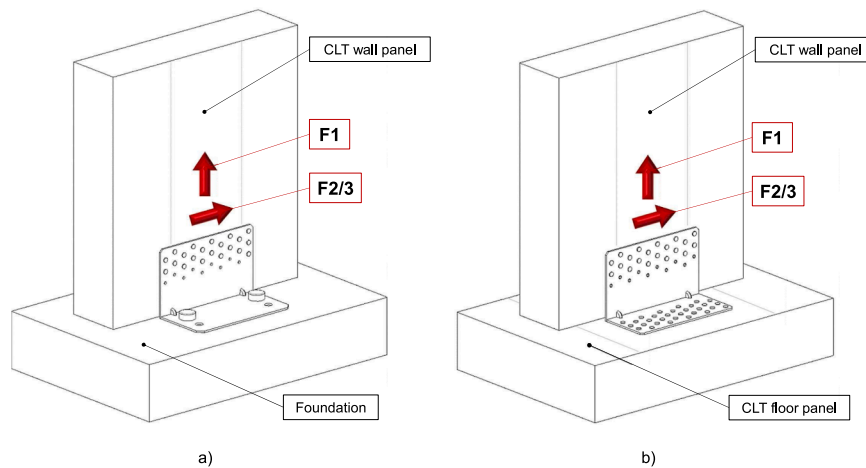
Angle brackets in: a) wall-to-foundation and b) wall-to-floor joint configurations, illustrating vertical-tensile (F1) and horizontal-shear (F2/3) load directions.
